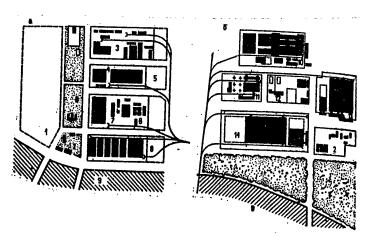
Example of planning industrial complexes consisting of the following enterprises: a--machinebuilding and construction industry; b--electric motor-building, metalworking, ferrous metallurgy; 1--reserve for developing the industrial complex; 2--administrative-public center; 3--construction industry enterprises; 4--reducer plant; 5--gear plant; 6--general complex projects; 7--shaft plant; 8--foundry; 9--developed residential and public territory; 10--rolled products plant; 11--reinforced-concrete structural elements plant; 12--general complex engineering support projects; 13--spare parts plant; 14--welded structural element plant.
